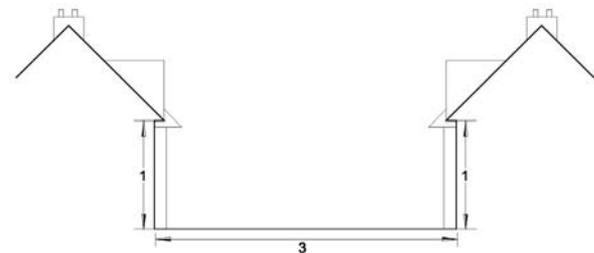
Architectural details such as gables, bays and chimneys greatly enrich the street scene and help to reinforce enclosure.
